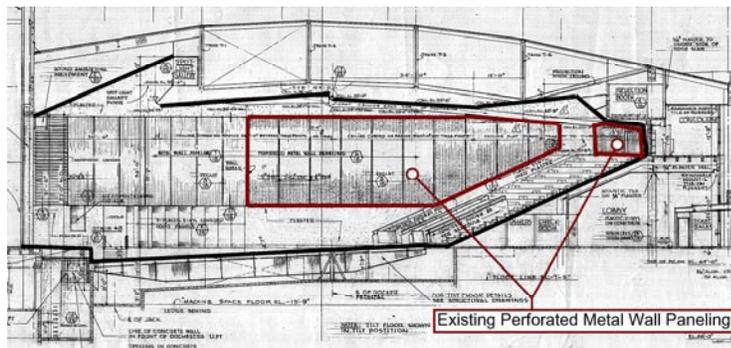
(A). Longitudinal section, existing absorption (perforated metal wall paneling)
